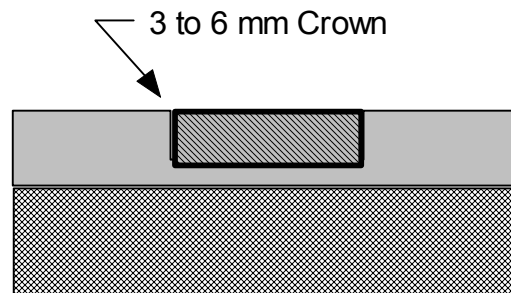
Finished Patch with a 3 to 6 mm Crown (4)
